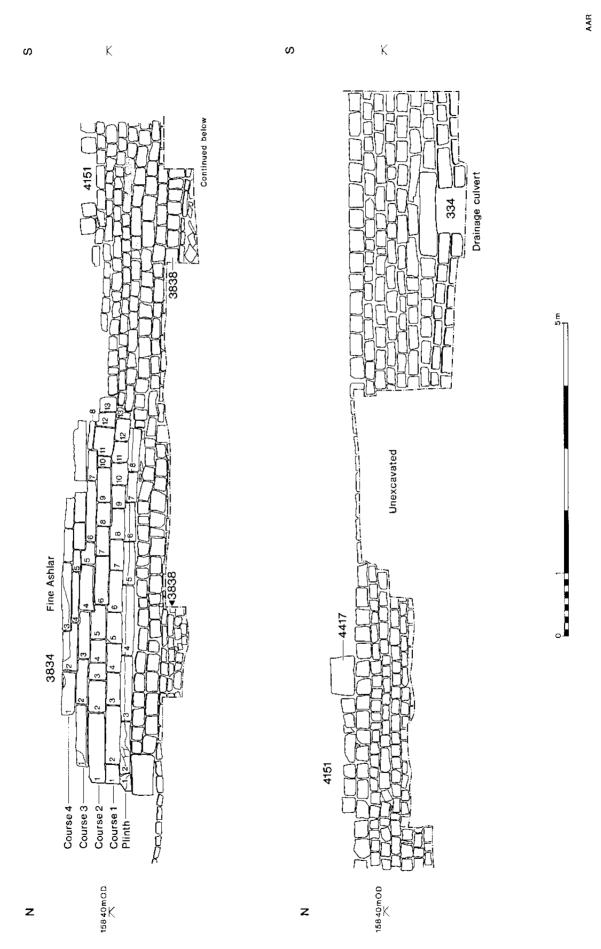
Elevation A, the west elevation of the fort curtain wall south of the porta principalis sinistra
